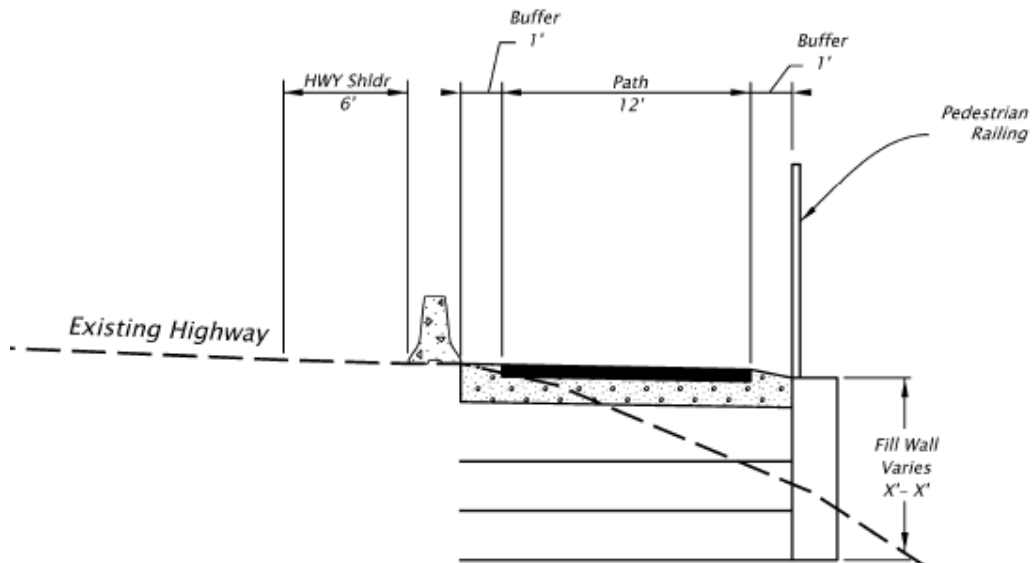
Alternative C1: Retaining Wall Typical Cross Section
